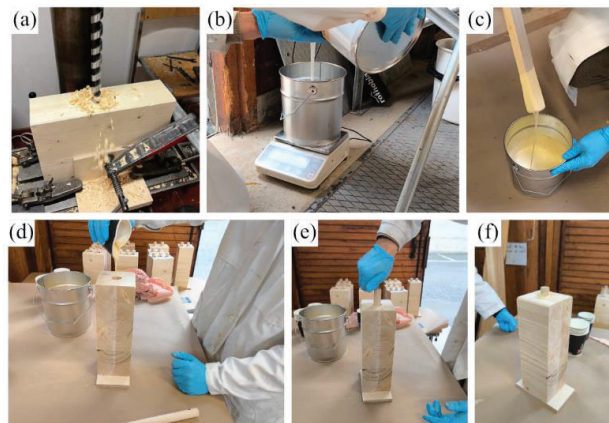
Assembly process for CPG reinforced by birch rods : (a) predrilling; (b) pouring adhesives and hardener in a container; (c) mixing adhesives and hardener; (d) pouring mixed adhesives into the predrilled hole; (e) twisting and pressing birch rod into the hole; and (f) assembled specimen.
